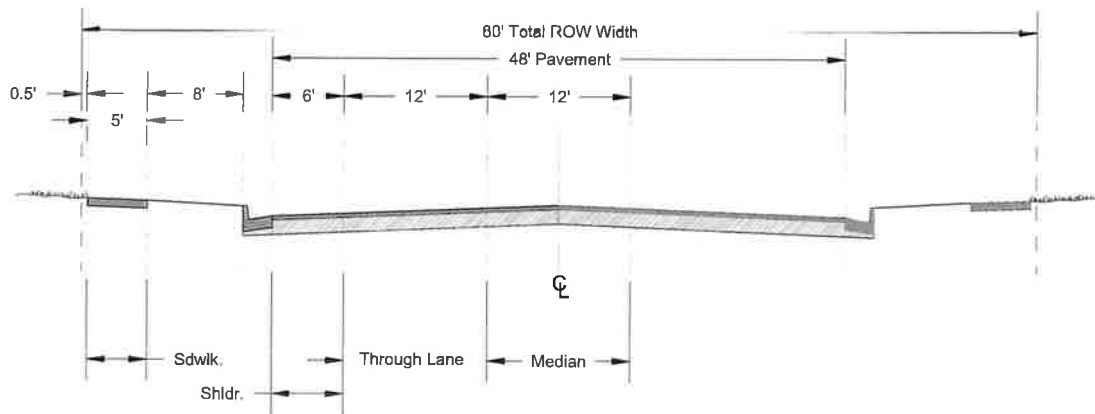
Typical Urban Minor Arterial Cross Section
